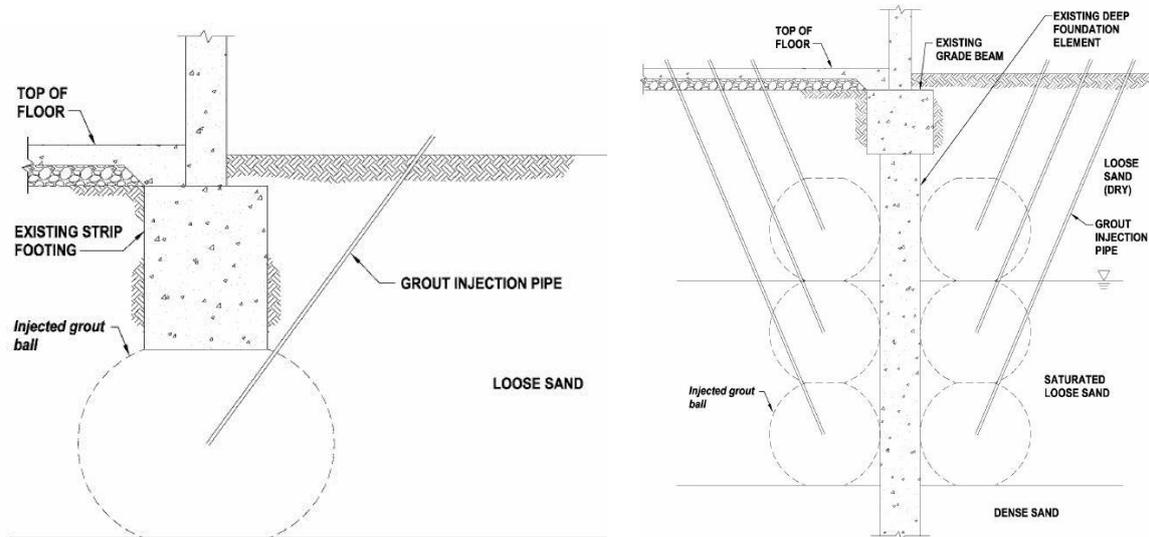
Permeation grouting under existing shallow foundation (left) and deep foundation (right) [1].
